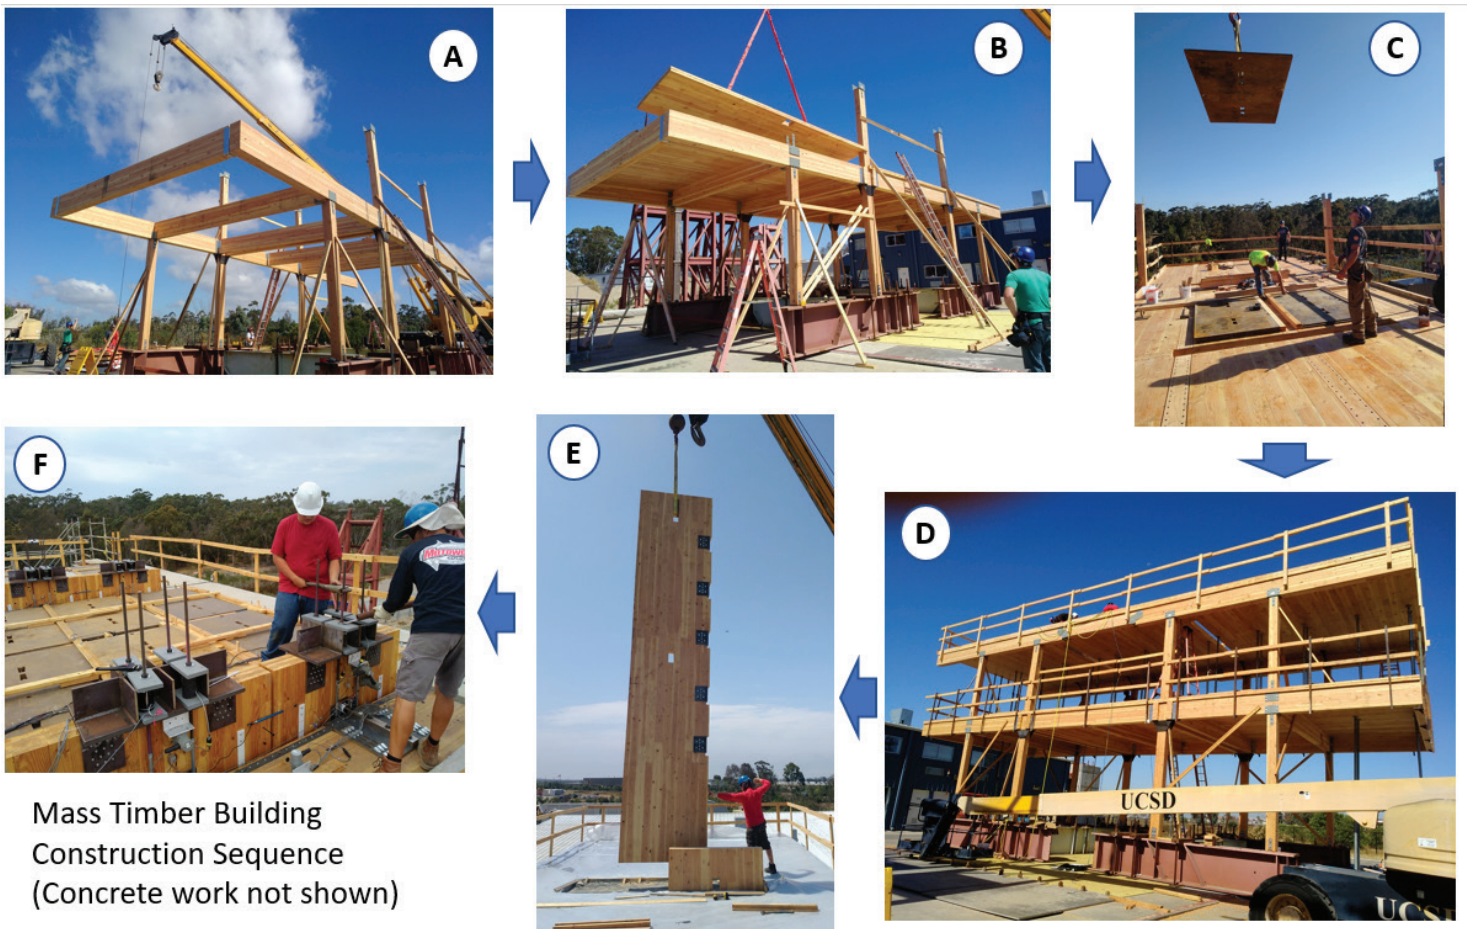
Construction process of the test building (only showing wood construction) (Pei et al. 2018)
